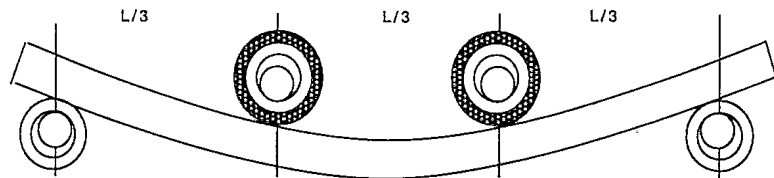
Loading Arrangement for R=0.1 Beam Tests.
